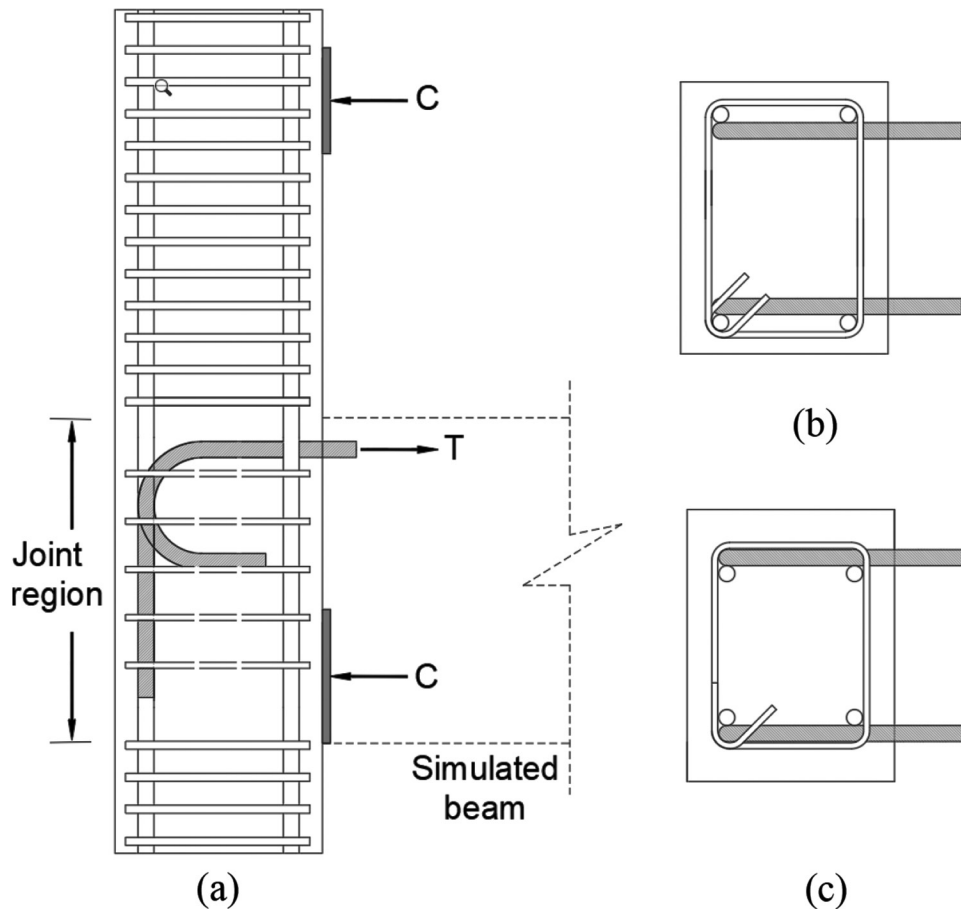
Schematic of typical specimen: (a) side view of specimen; (b) cross section of specimen with two hooks inside column core with confining reinforcement; and (c) cross section of specimen with two hooks outside column core with confining reinforcement.
